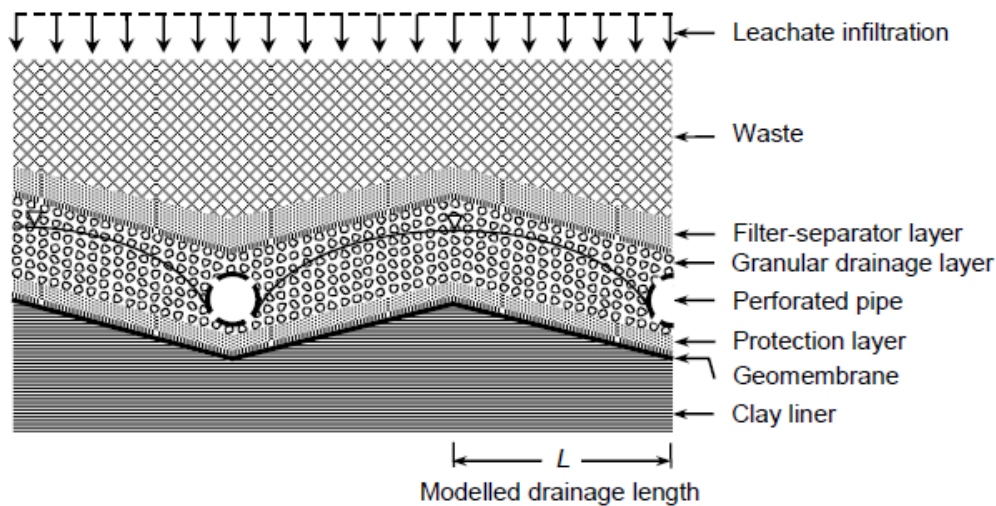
Sketch of Typical Landfill Bottom Cross Section.
